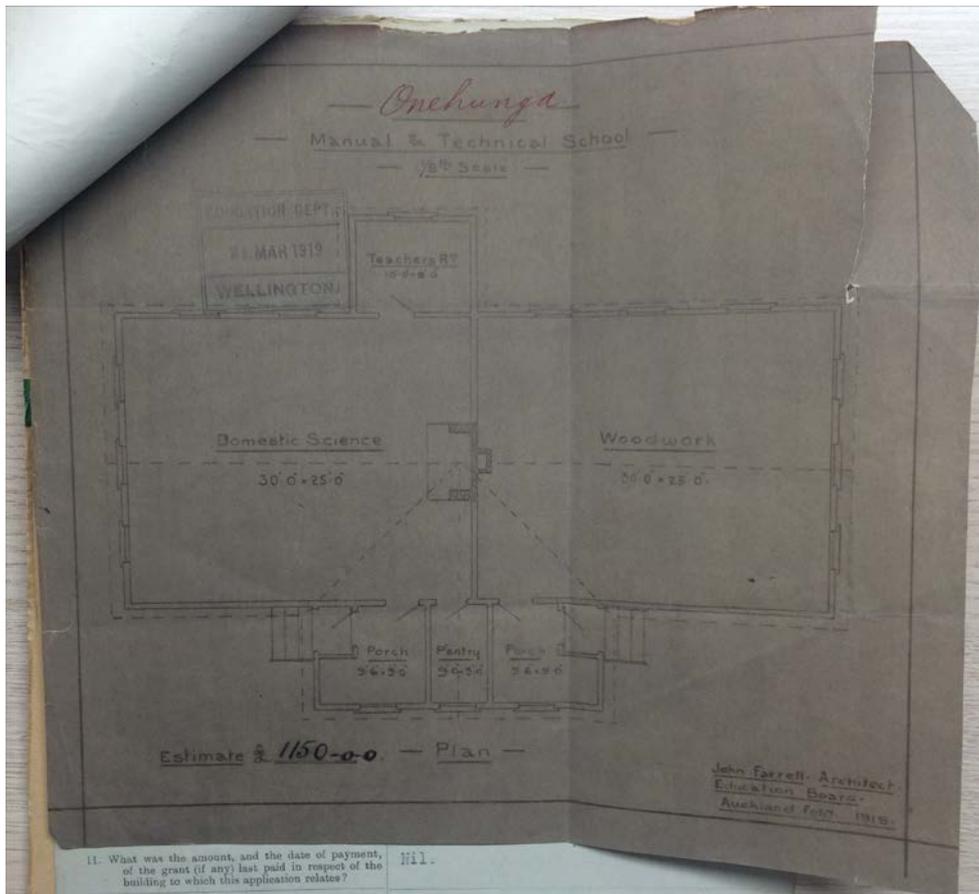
Proposed plan March 1919. Shows one single building with two rooms; one for domestic science and the other for woodwork. (Education Department. (1919-1981) Buildings and Sites - Onehunga Manual Training Centre (R22887276) at Archives New Zealand)
